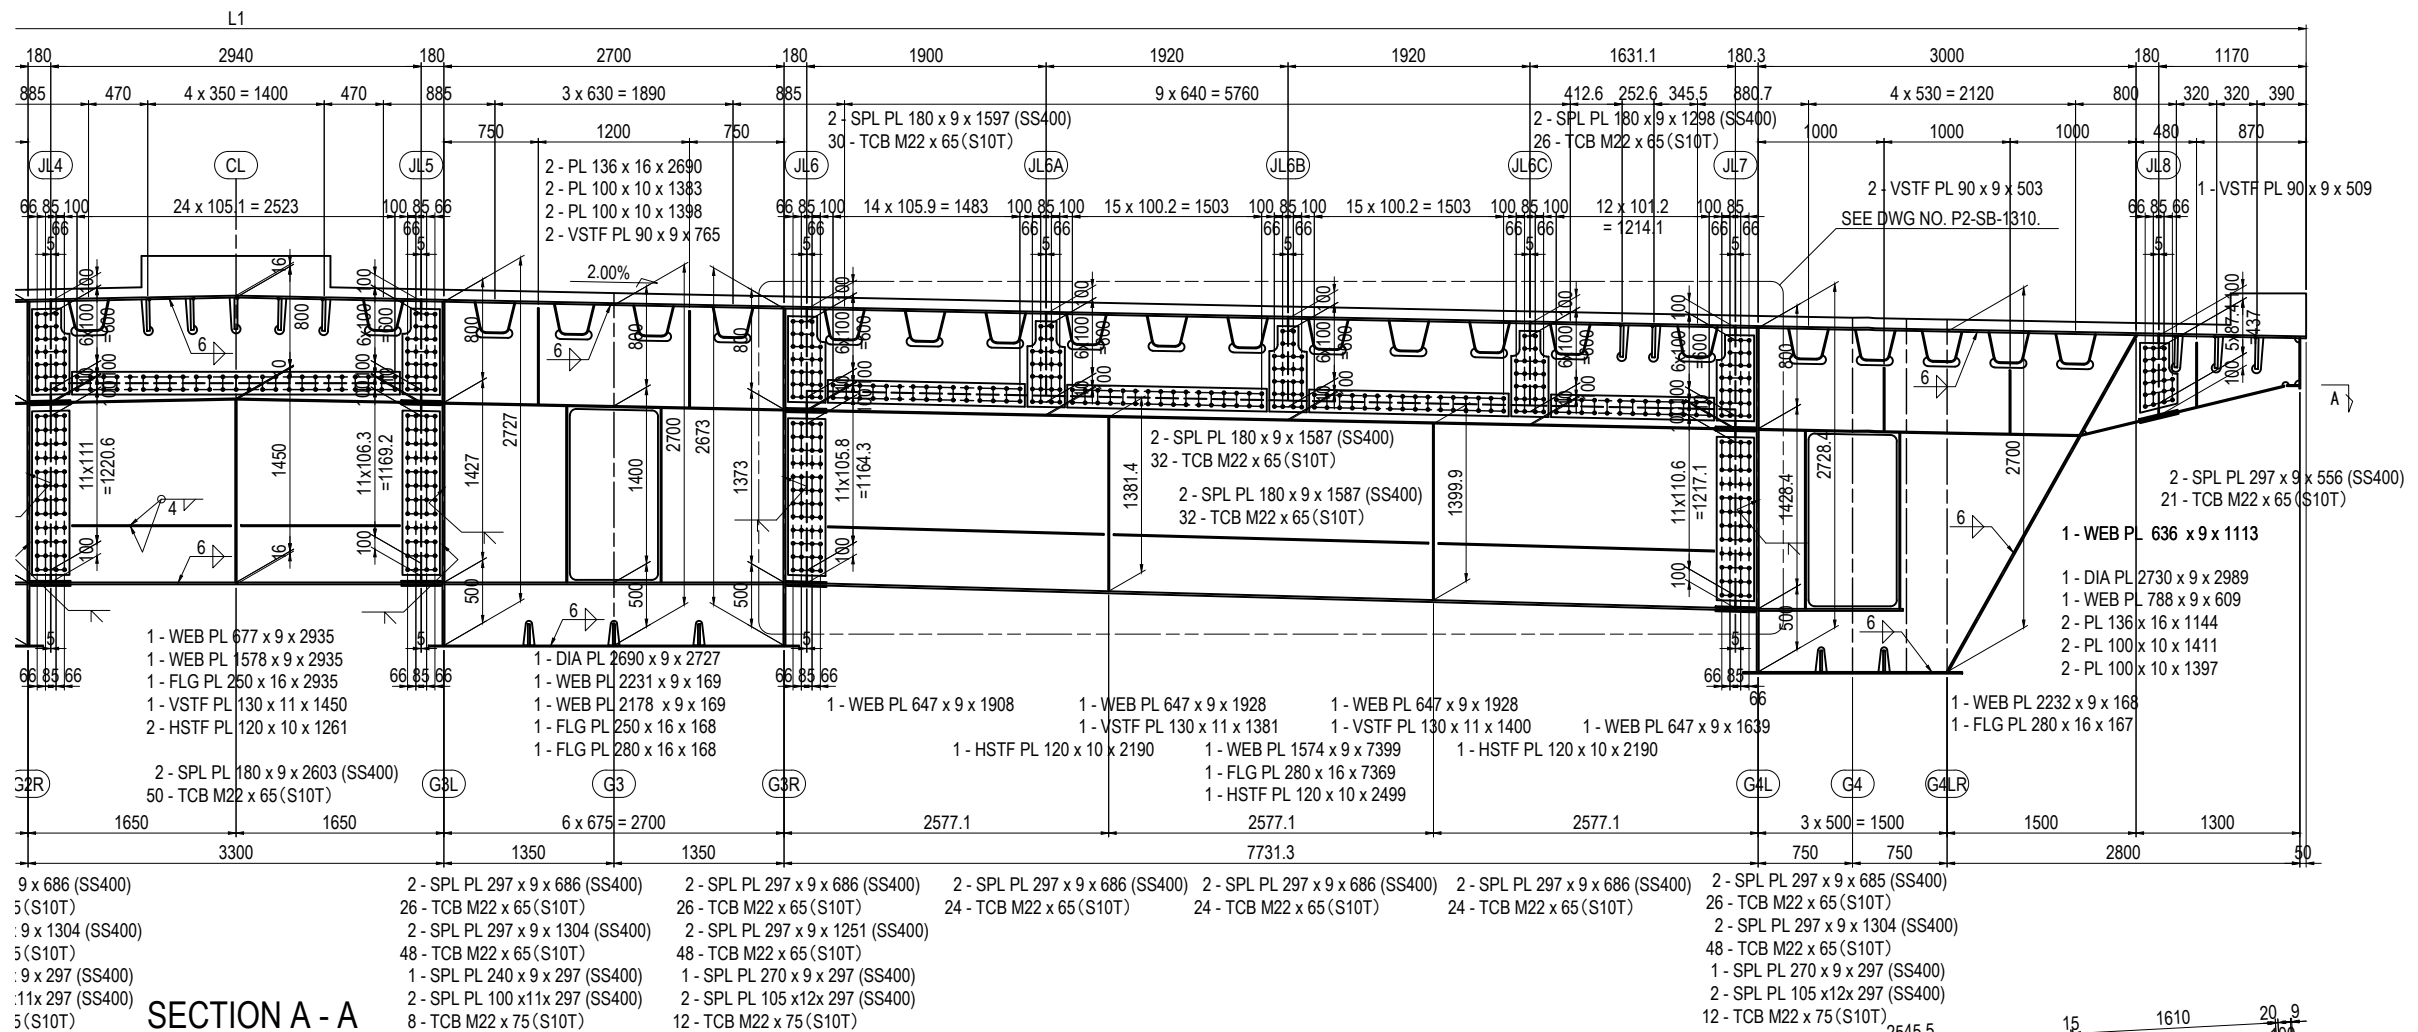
DETAIL OF CROSS GIRDER SECTION (1) S=1:60 C1 TO C3 (1)
